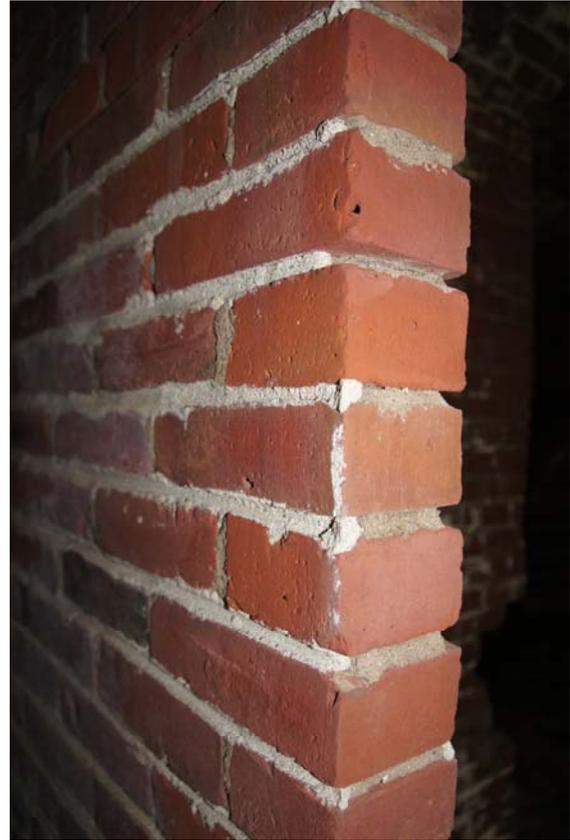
Brick Mortar Sample #9: 1st Tier interior brick veneer wall – bedding mortar
